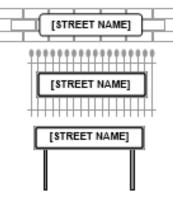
PLATE AFFIXED TO WALL. No frame for the plate is required and is to be fixed directly into the wall.
